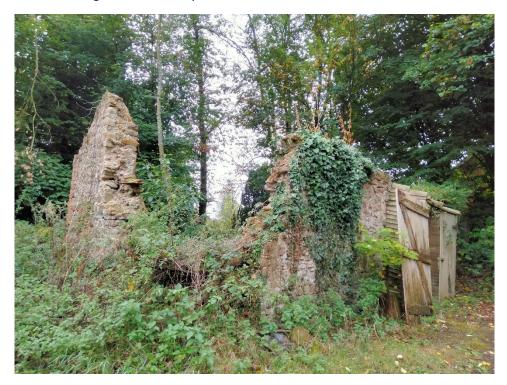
The remains of the original barn after its roof structure and some of its walls collapsed in 2020.
